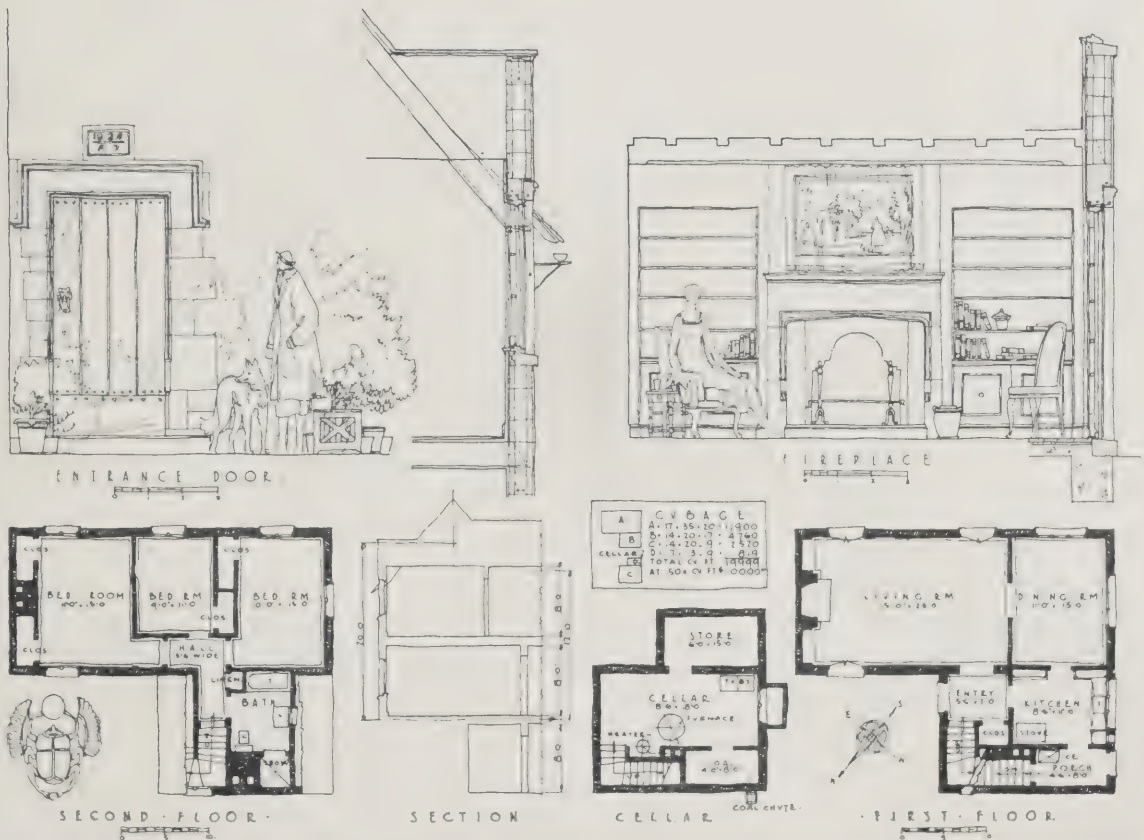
B, G. Dewey Swan, c/o H. T. Lindeberg, 2 West 47th Street, New York.
